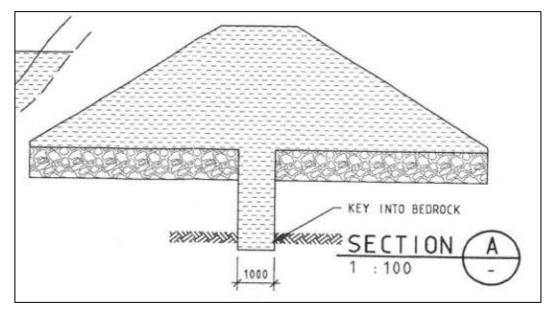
Detail of the clay barrier beyond the two ends of the sheet pile wall (image courtesy of Royds Consulting 1995)
